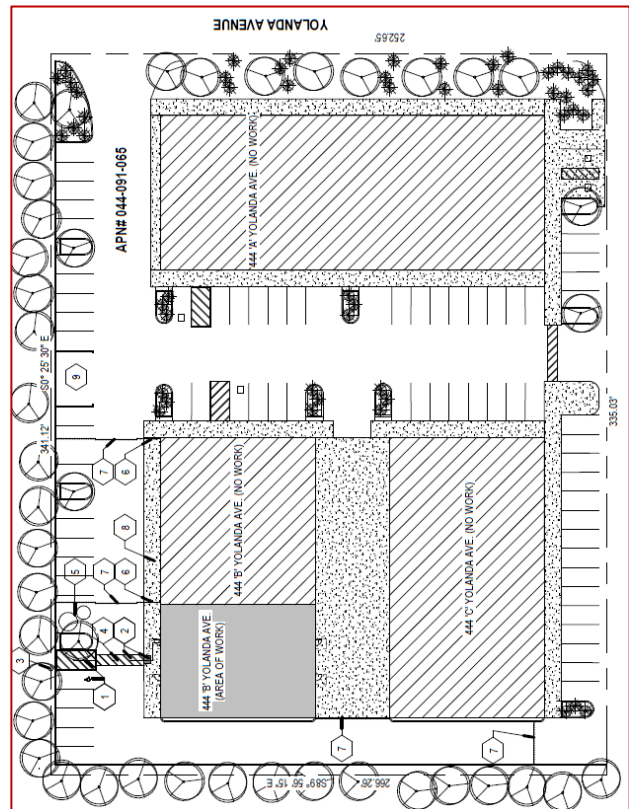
Site Plan (proposed security gate is indicated as item 7)
